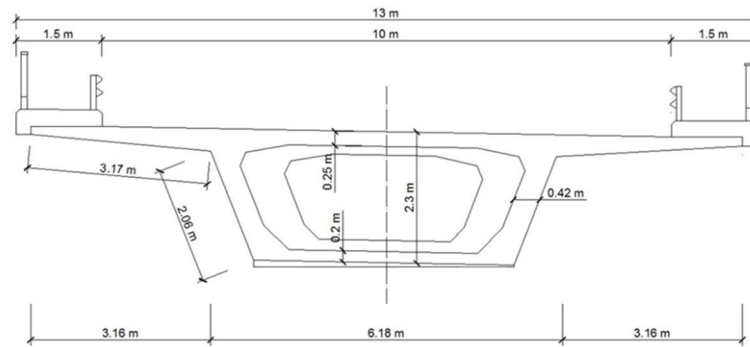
Cross section of the Arosa's concrete bridge deck
